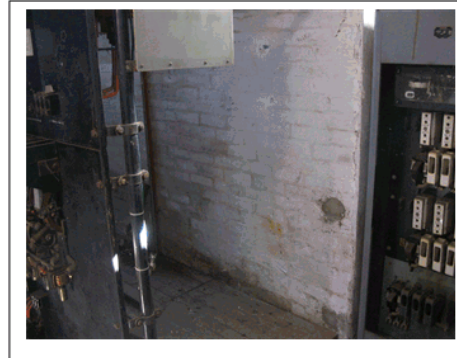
C & D Building – wall paint in Sprinkler Room (Sample Pb2: 0.014% - Non-Lead Paint).
